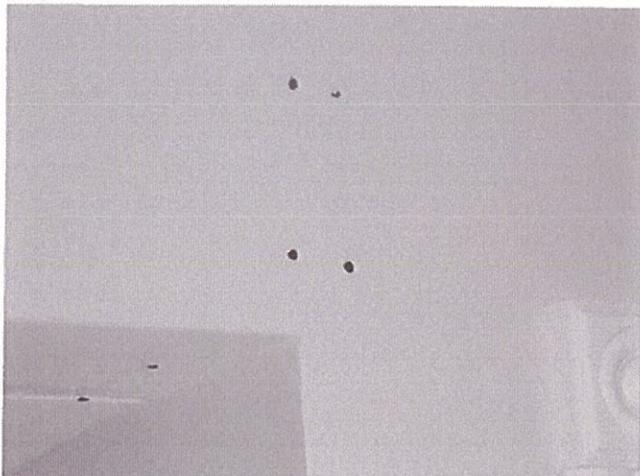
" continued cracking in ceilings and walls. House not through bolted.
